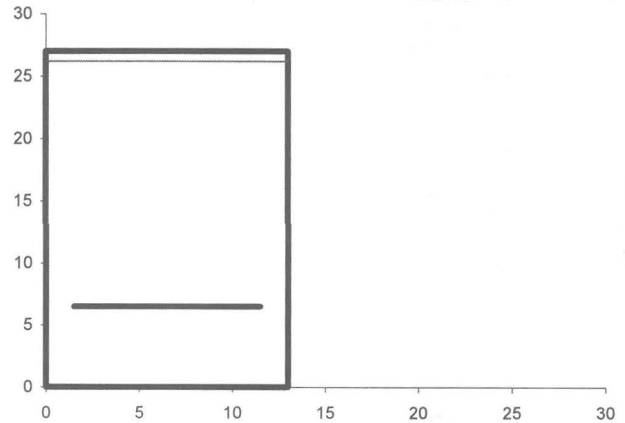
Beam cross-section with Whitney's stress block and reinforcing.
